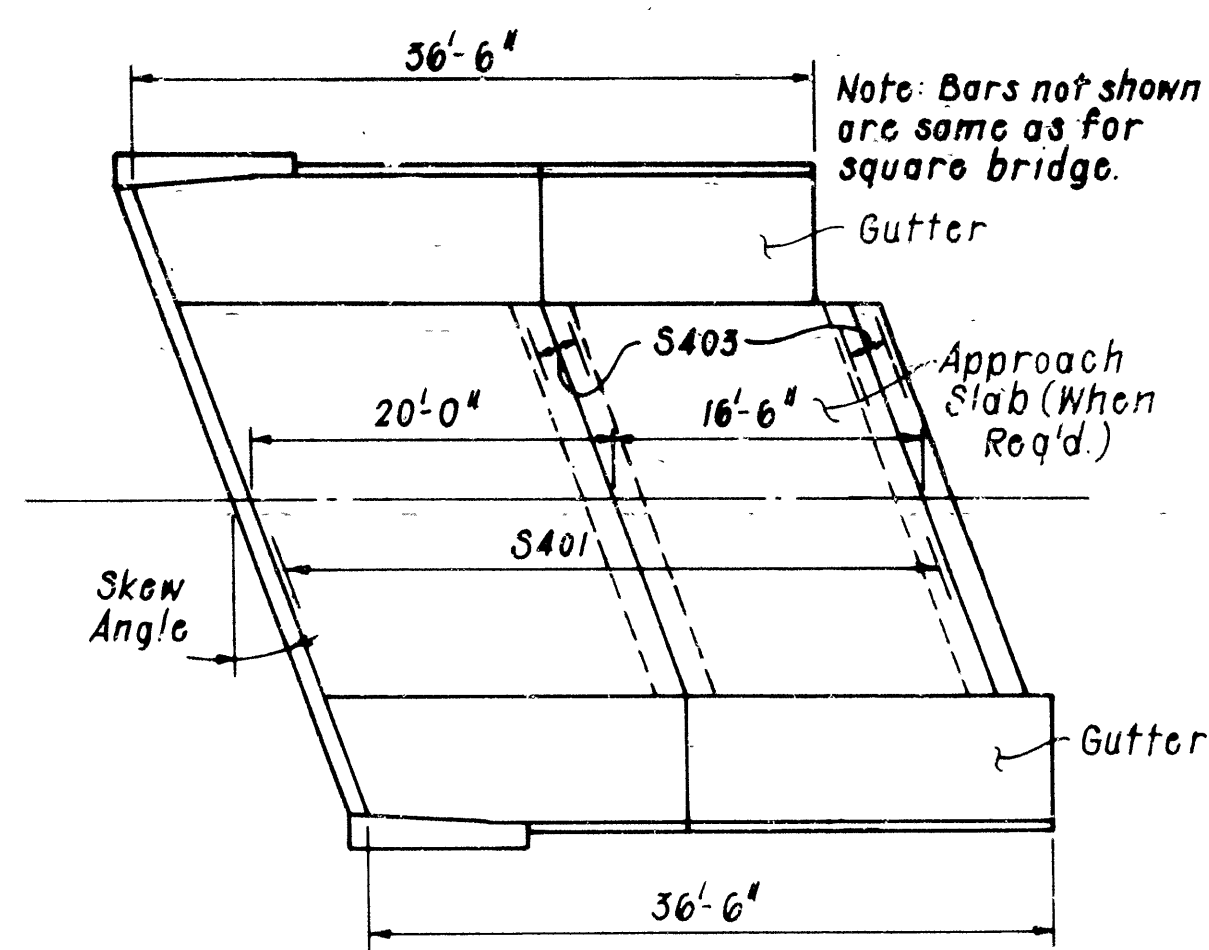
DETAILS OF LONGITUDINAL CONSTRUCTION JOINT
